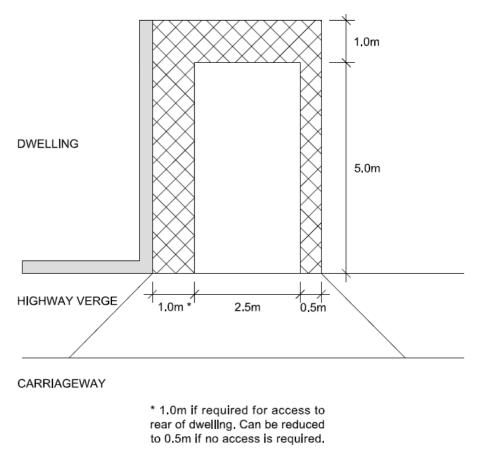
Typical layout for on plot parking (in front of dwelling)
